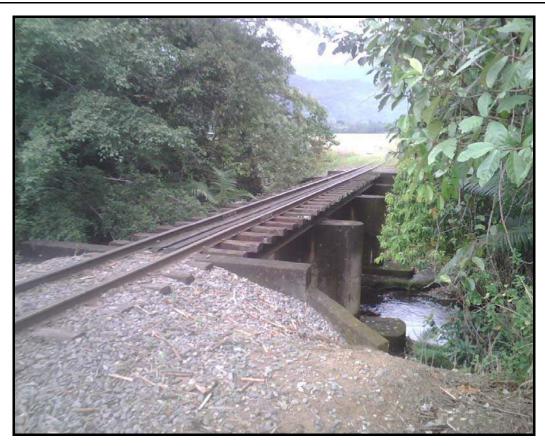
Cane Railway crossing over Marrs Creek (downstream of site)
